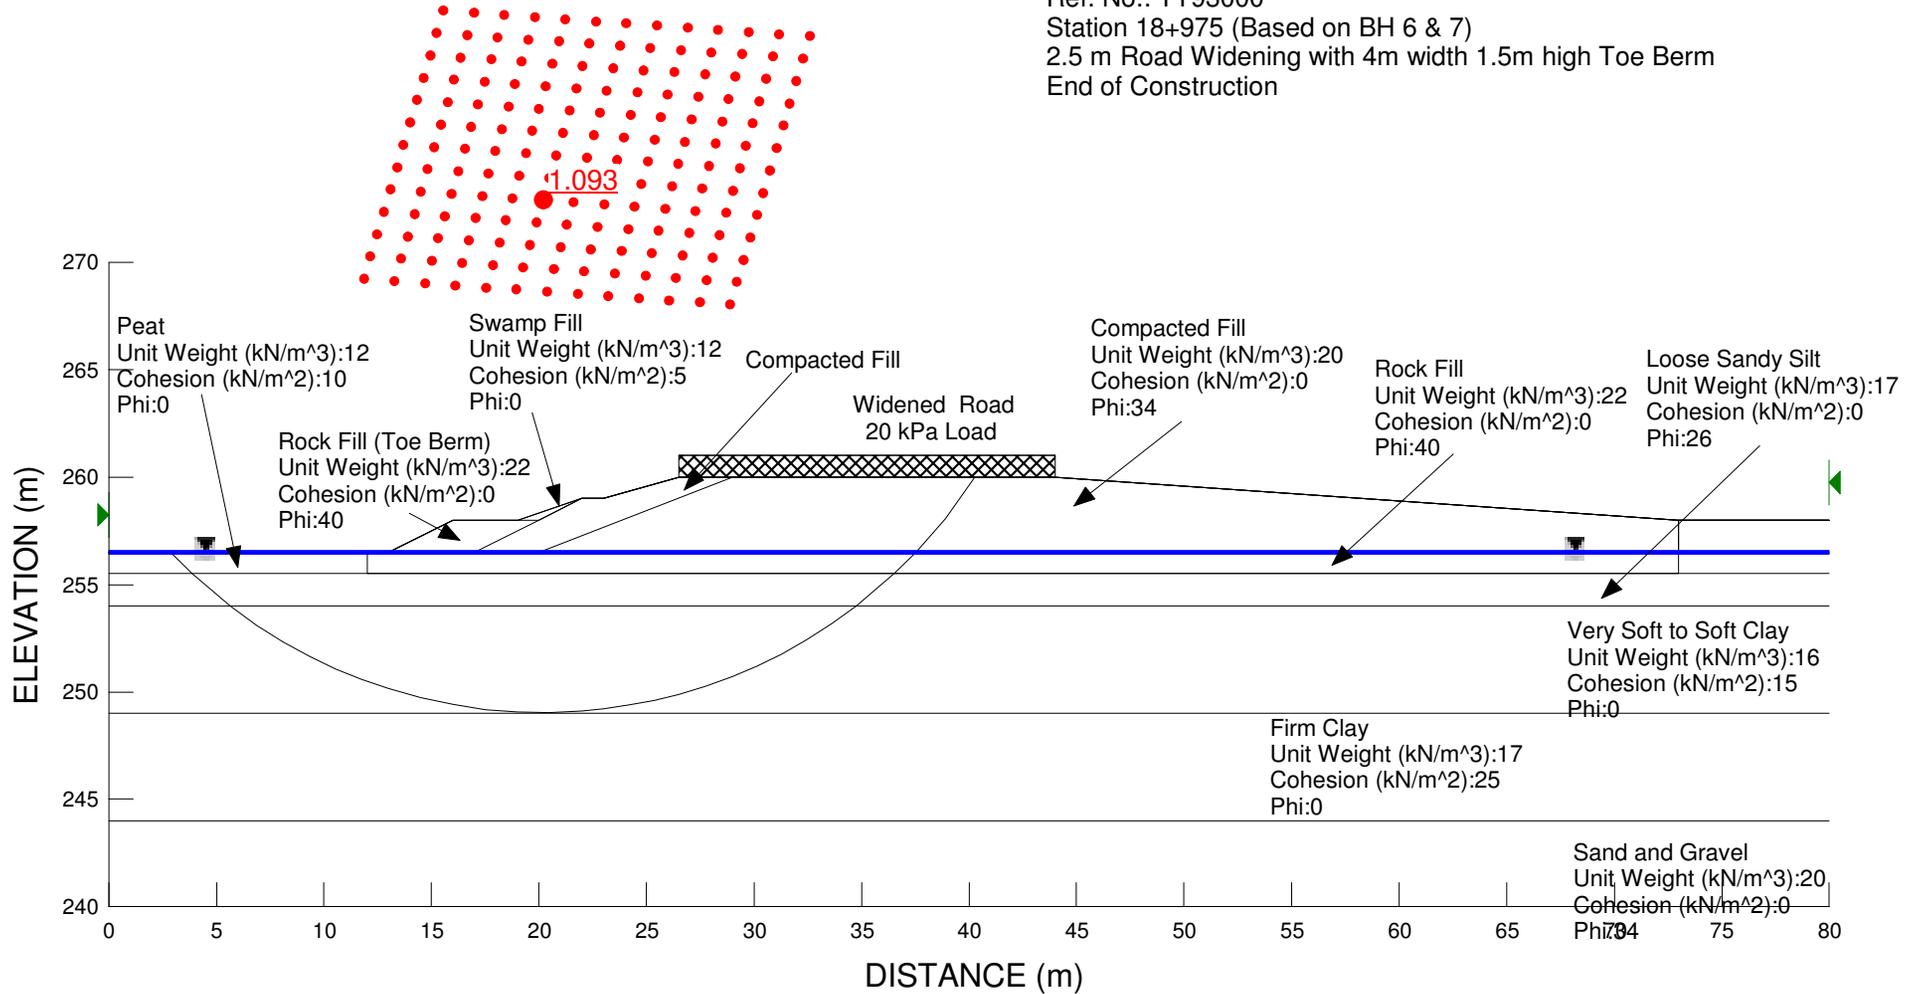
Slope Stability Analysis of Section at Station 18+975 - 2.5 m Road Widening with Toe Berm (End of Construction)
